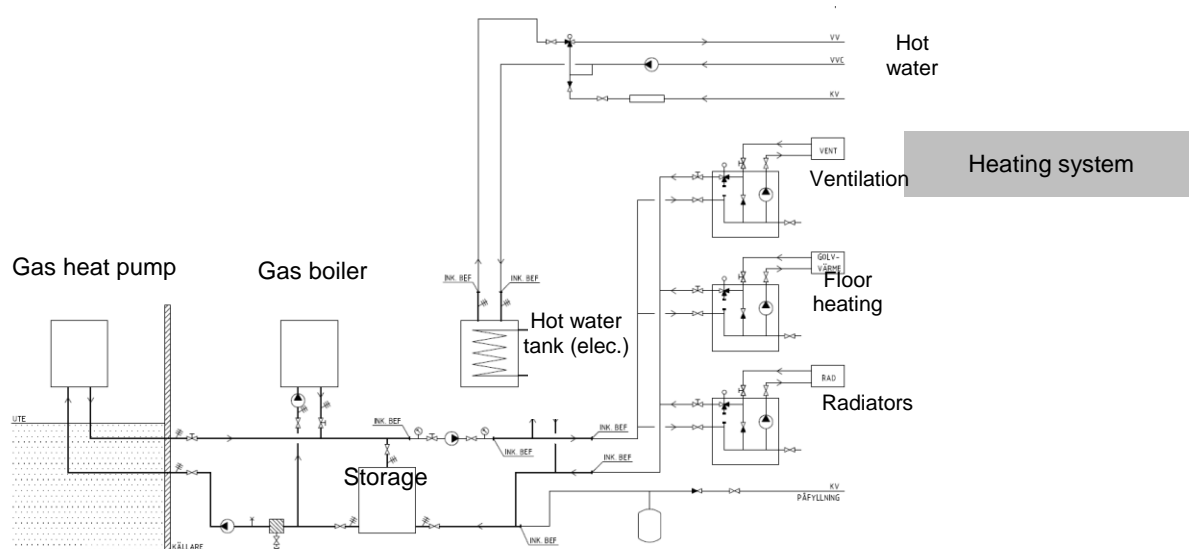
System layout with gas heat pump, gas boiler and heat storage
